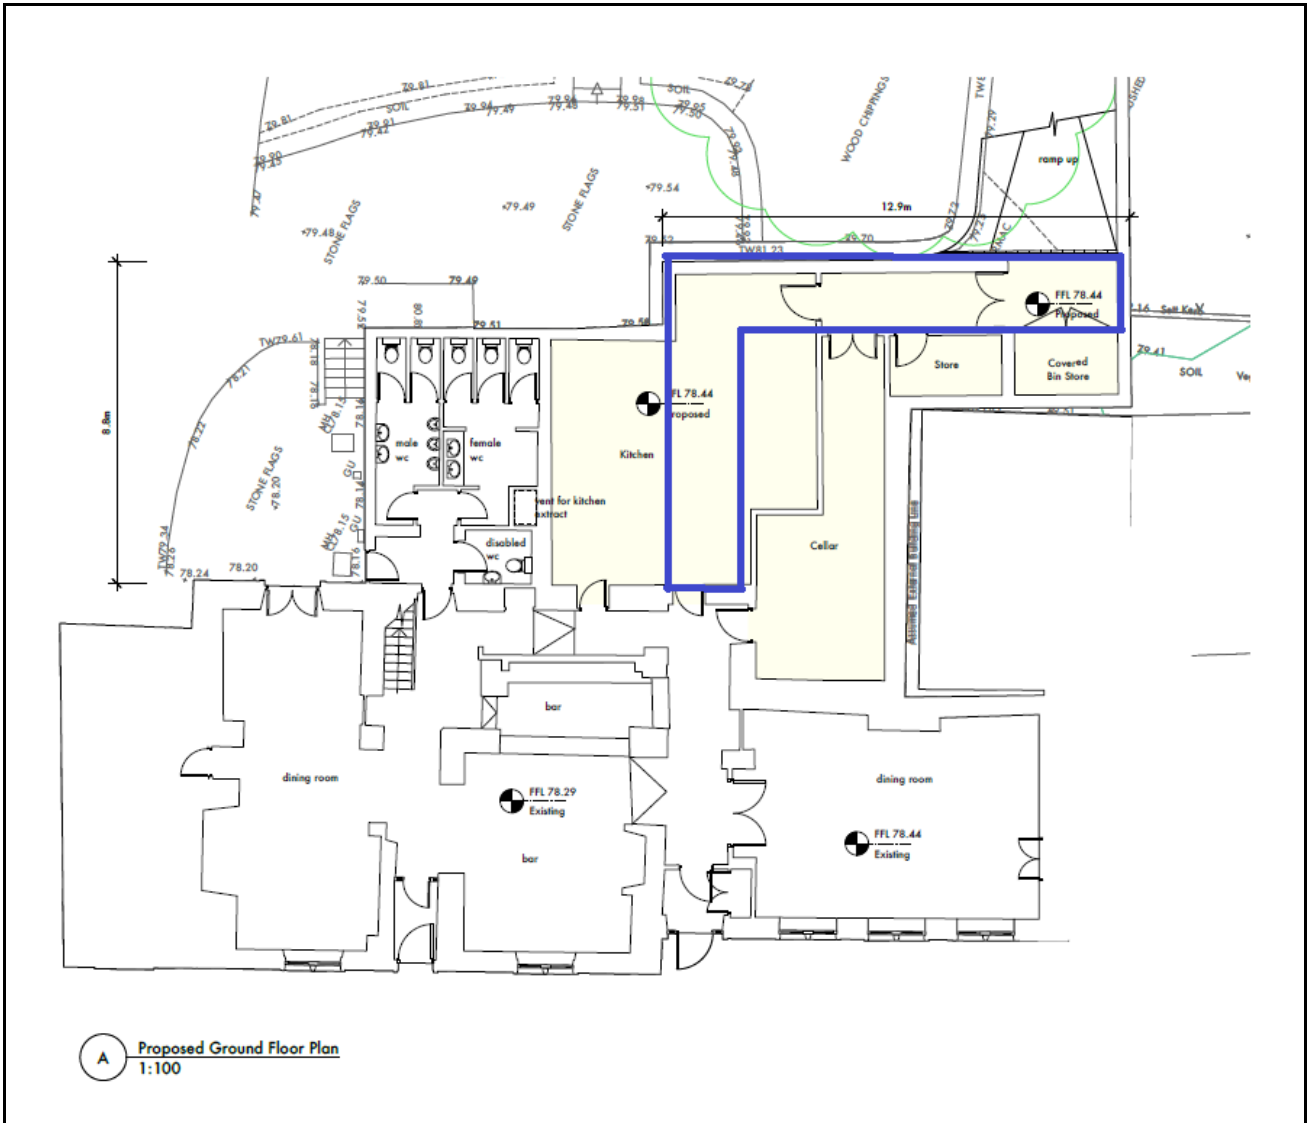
Proposed ground floor plan showing extent of new build which will include additional storey above as shown in figures 10 and 11
